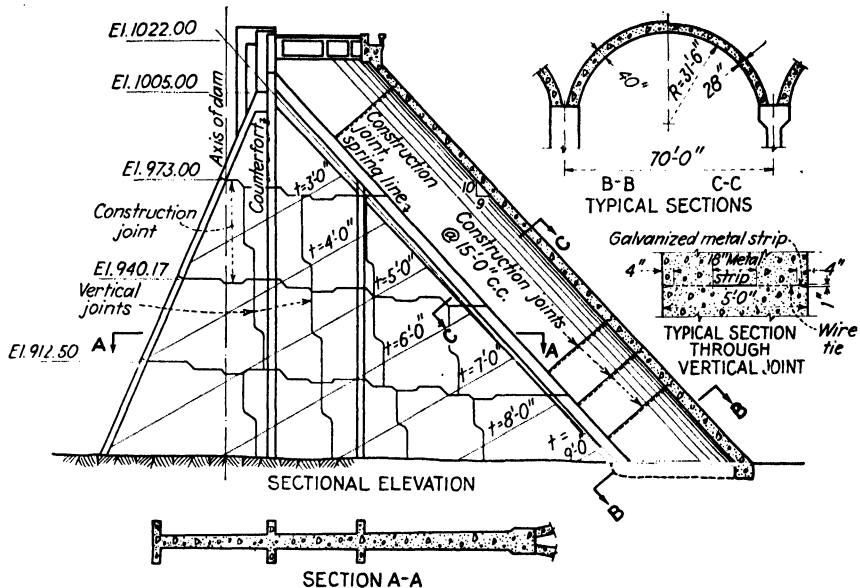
Buchanan Dam. Buttress elevation and sections.
